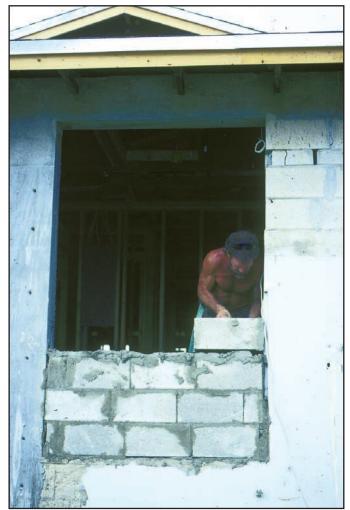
Windows and doors are added. The height of the raised front door shows the amount of elevation.
